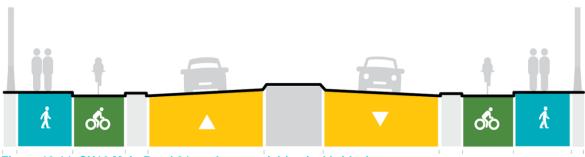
SH16 Main Road 24m urban arterial (typical bridge)
